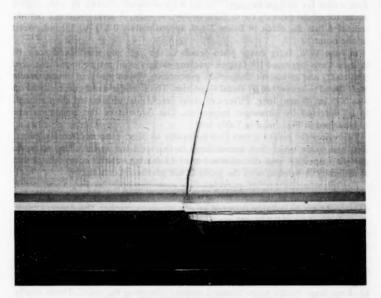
Fractured Girder Discovered in 1970
